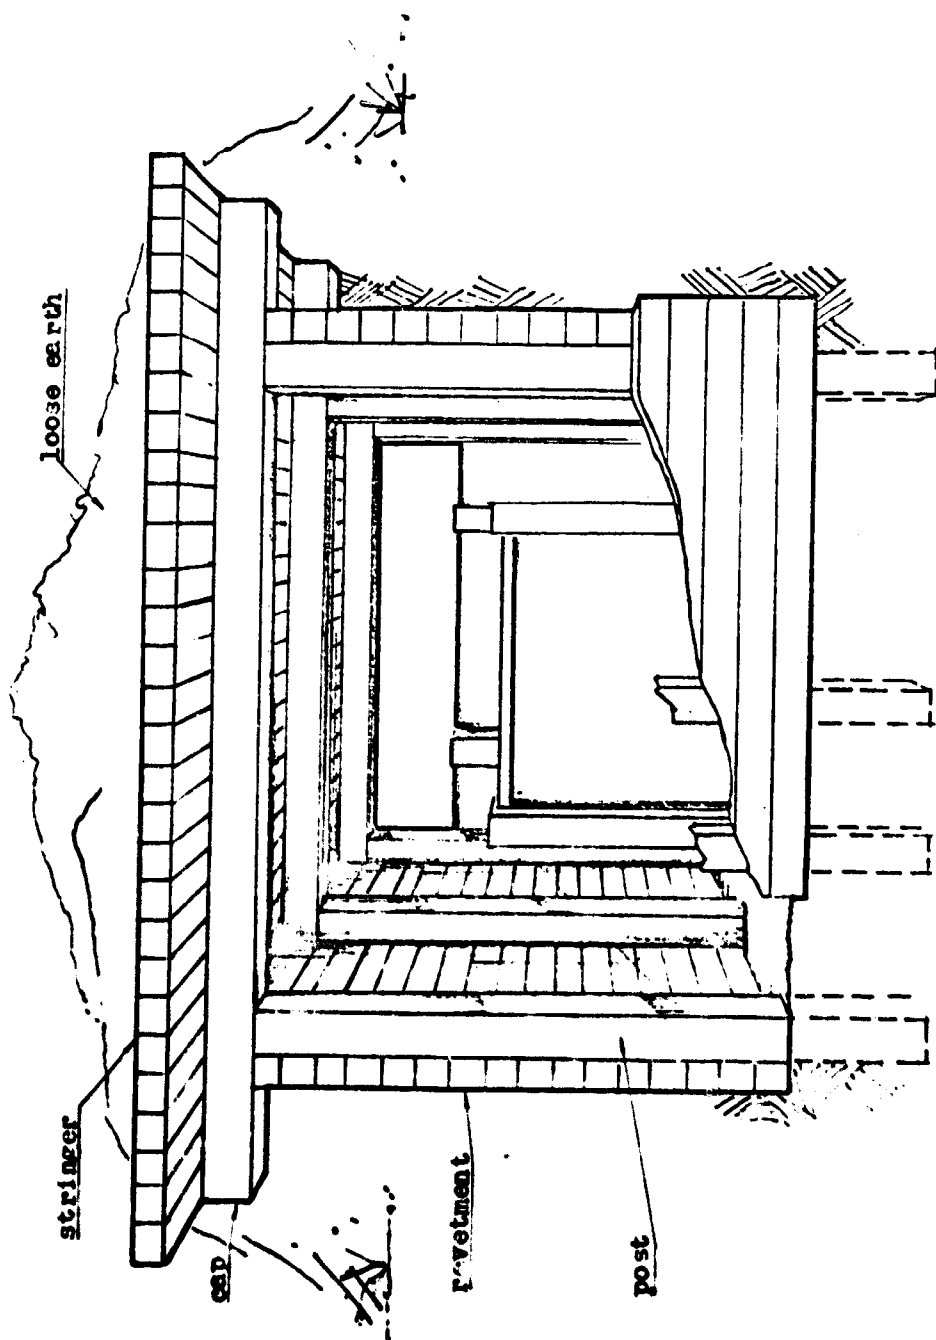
Machine Gun Emplacement with Continuous Stringers
